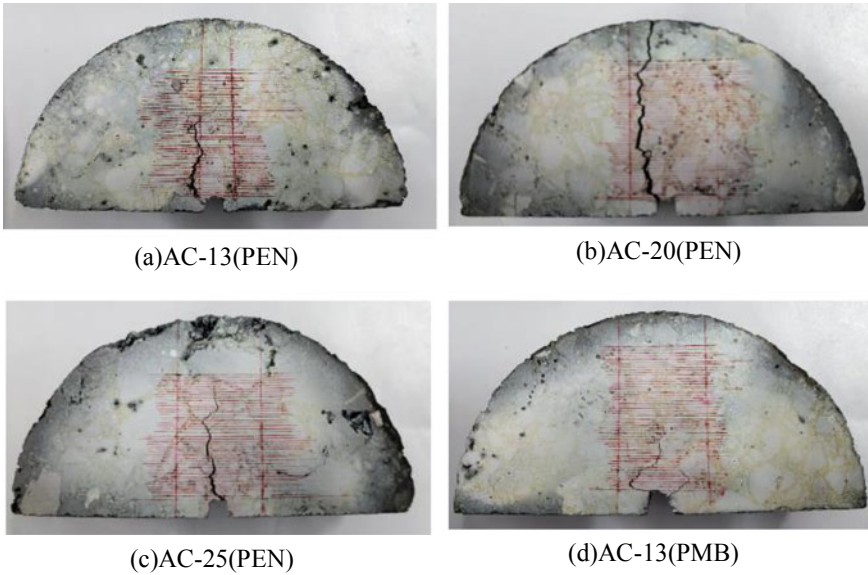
Fatigue crack propagation of asphalt mixture specimens
